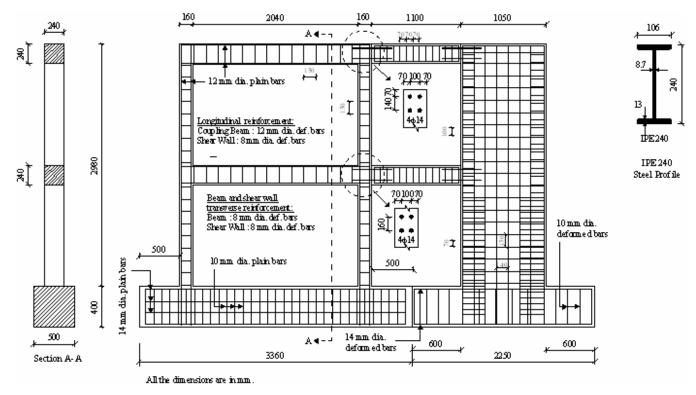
Dimensions and reinforcement schemes of the RC frame and external shear wall of the 2nd group tests.
